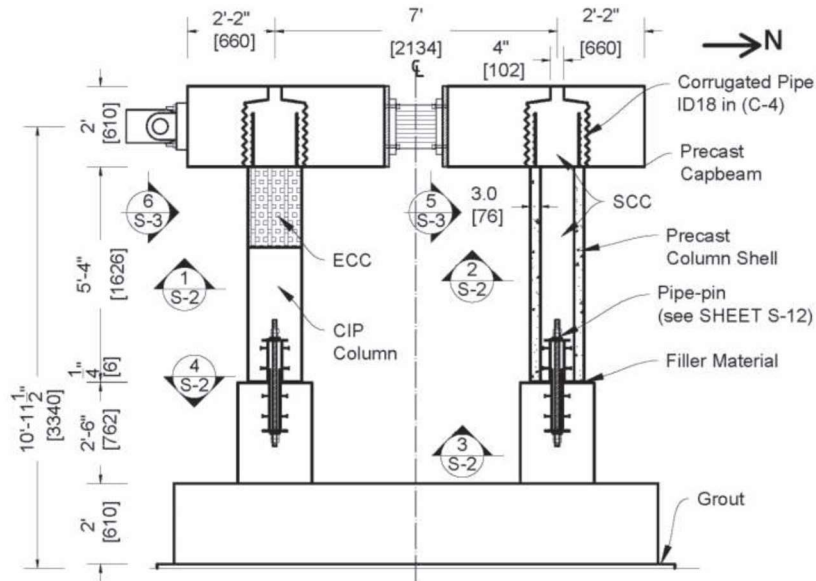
Mehraein (2016) BRSA Rebar Hinge Detail
